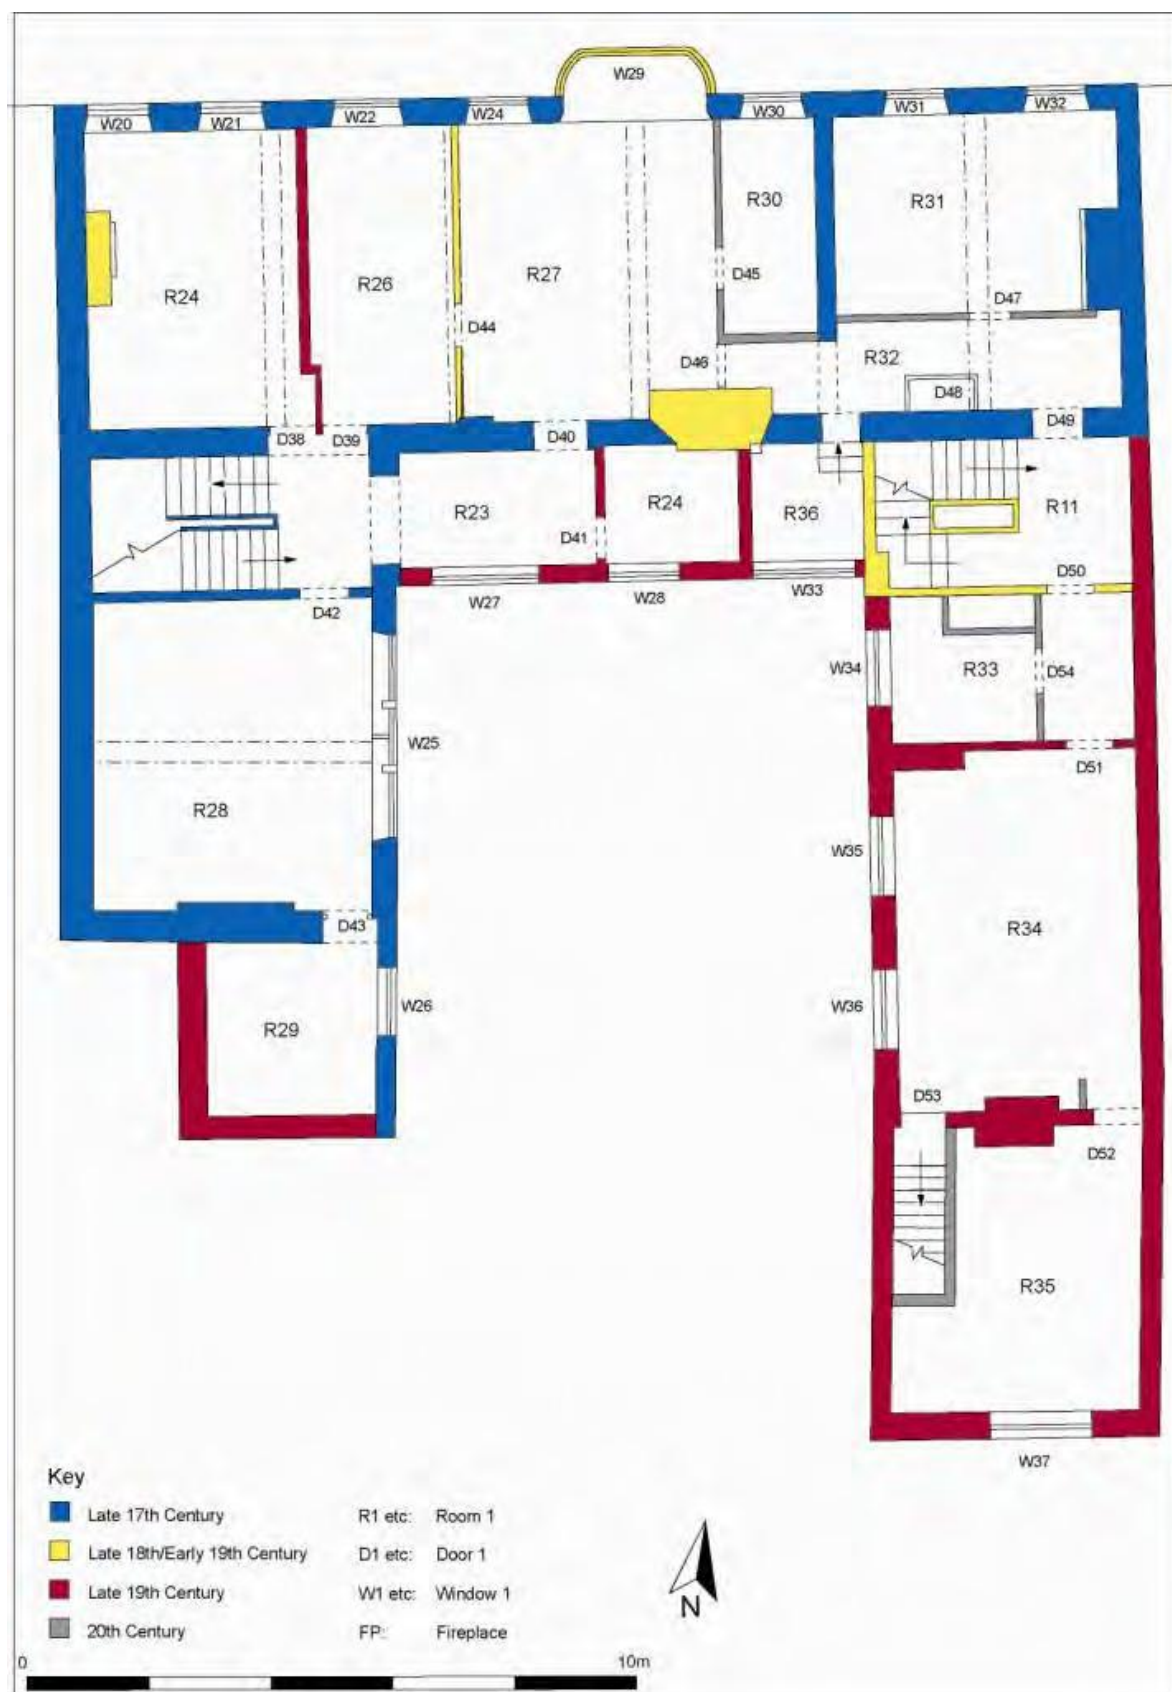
Phased first floor plan of 28 Bridgeland Street.
